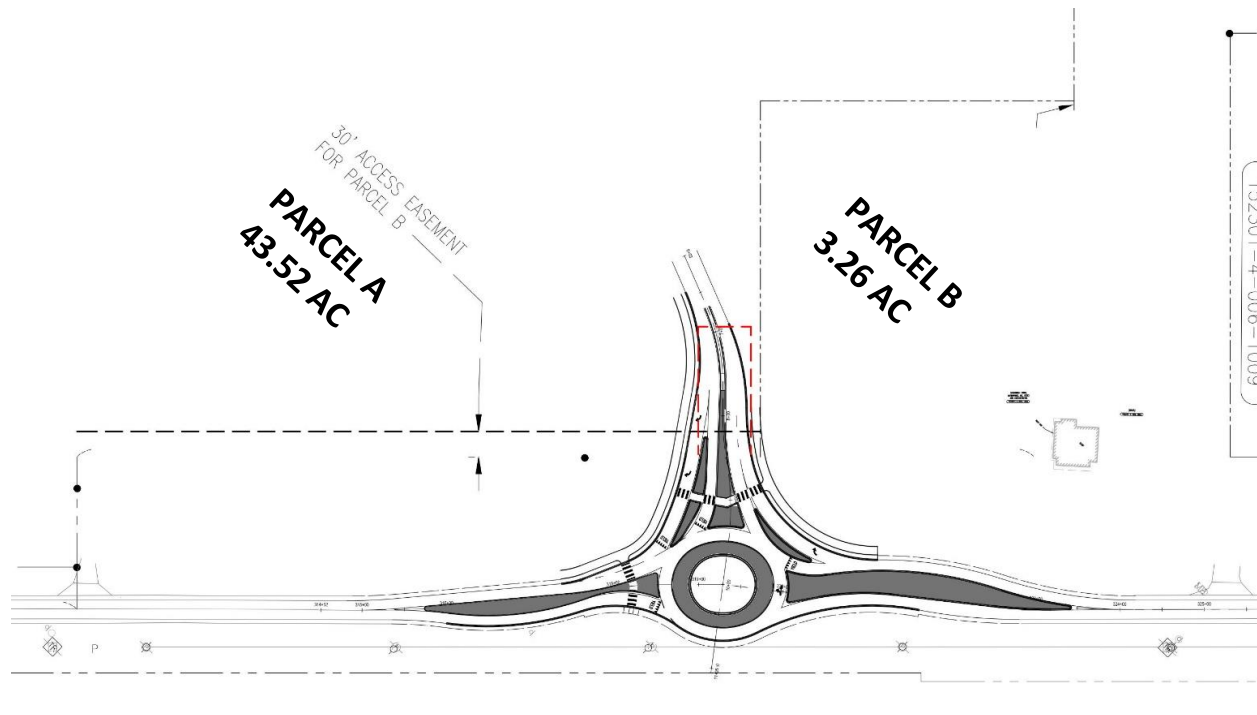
Skokomish Site Access Roundabout Layout with Parcel Location
